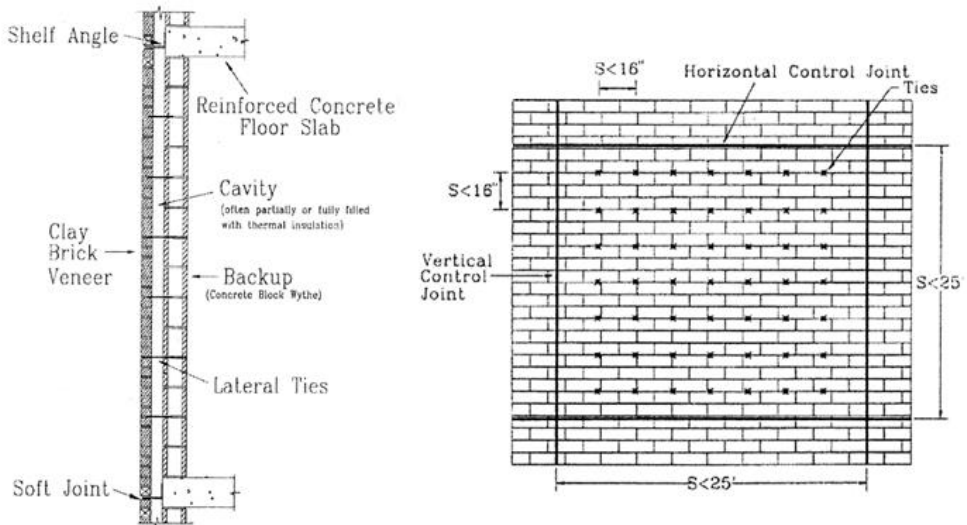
Section and elevation of a typical brick veneer wall system (Ali M. Memari et al, 2002)
